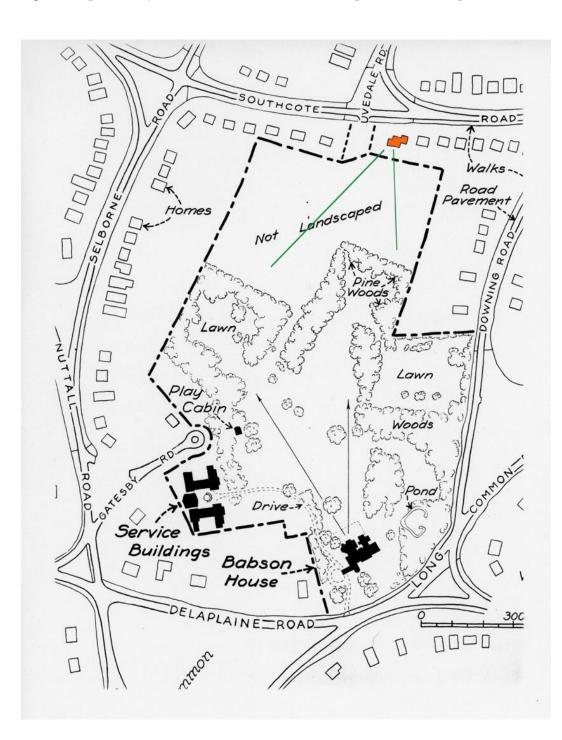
Site plan of adjacent Babson Estate with visual/spatial relationship to Benda House (in orange)
